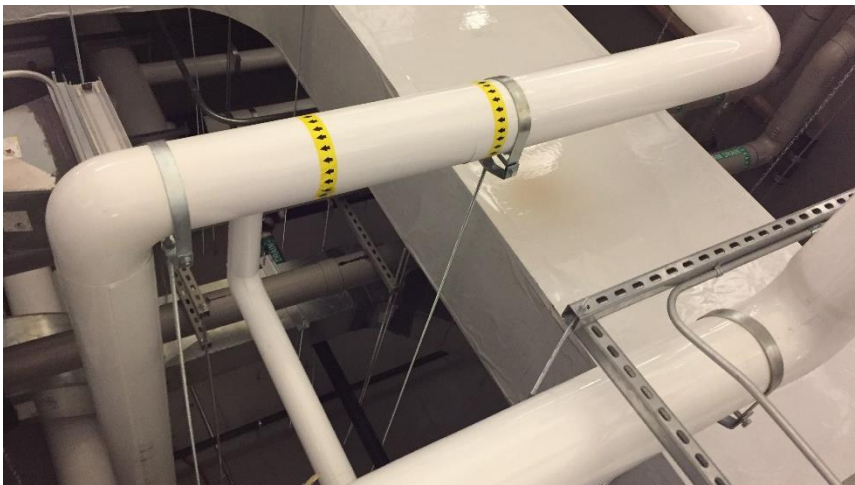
View of the non-asbestos containing pipe straight insulation observed throughout C043.
